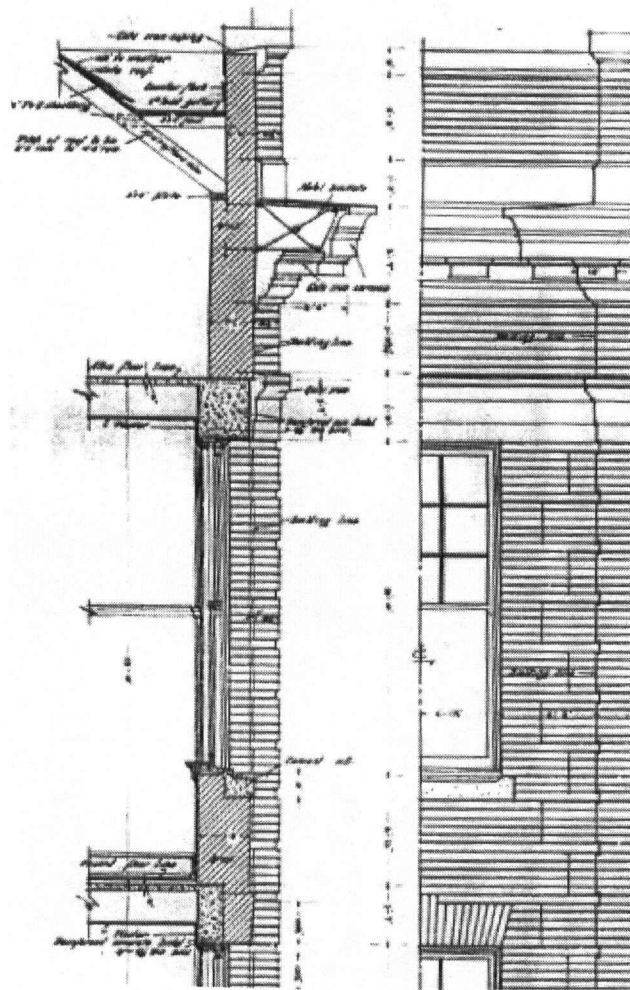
Typical Elevation of the Upper Storey of a URM School Built in the Early 1900's
